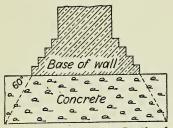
Diagram explaining Depth of Concrete under Wall.
